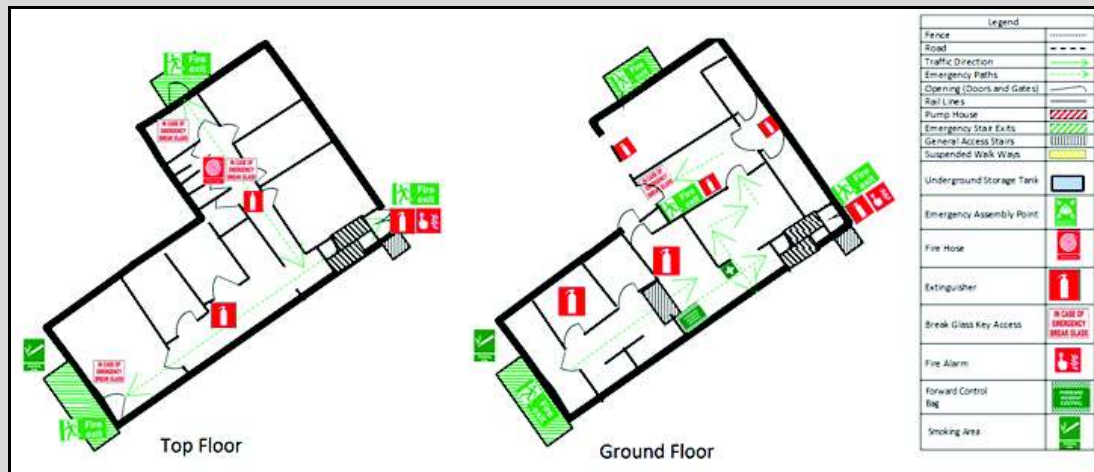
OTGC Office Building at the Existing Storage Terminal.
